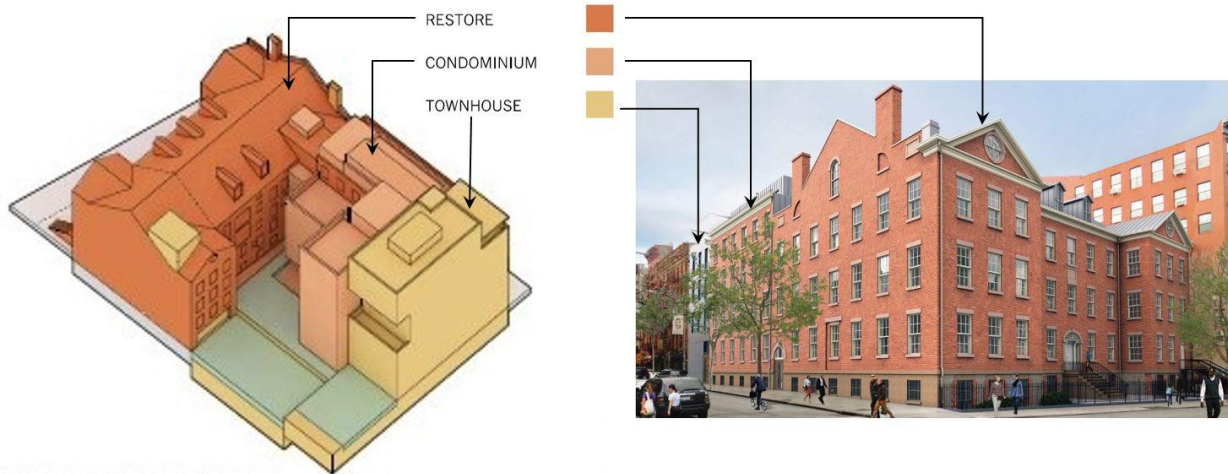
Proposed Project Site Renderings <sup>1</sup>
